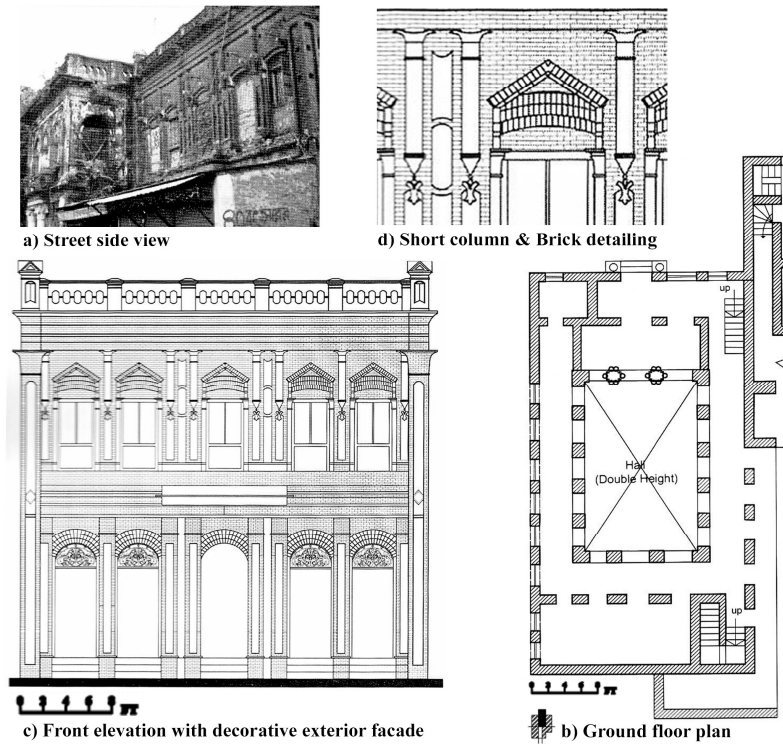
a) Street side view, b) Ground floor plan, c) Front elevation, and d) Short column & Brick detailing of the Building no. - 01.
